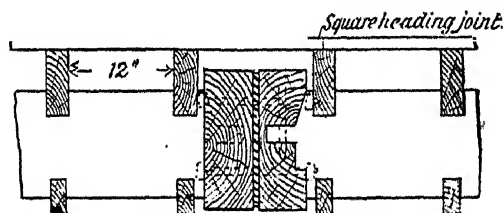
Section through a Wooden Girder showing Tusk-tenon Joint between Binder and Girder.
